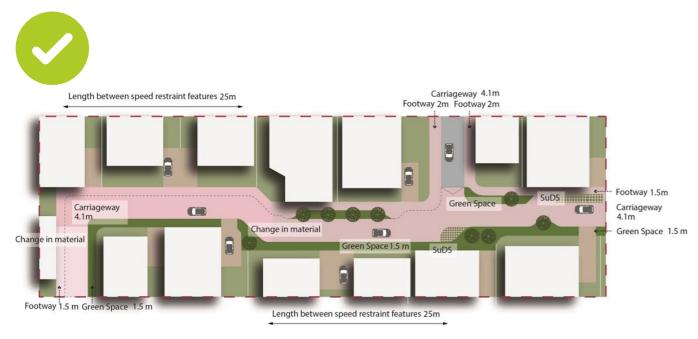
Street Typology Plan for a Residential Link Street in an Urban Context
